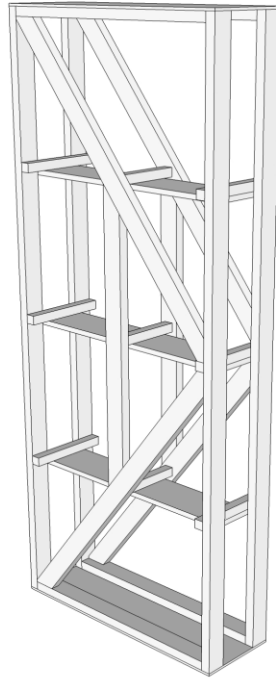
Wooden frame of panel T2 (with struts)
